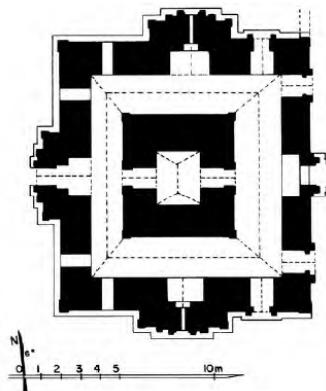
Plan of a typical Monastery (Pichard, 1992)
